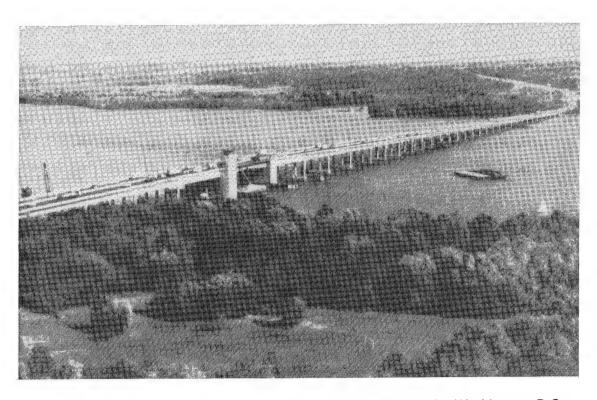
Woodrow Wilson Memorial Bridge, a major traffic area for Washington, D.C., and surrounding areas (from ASCE 1984)
